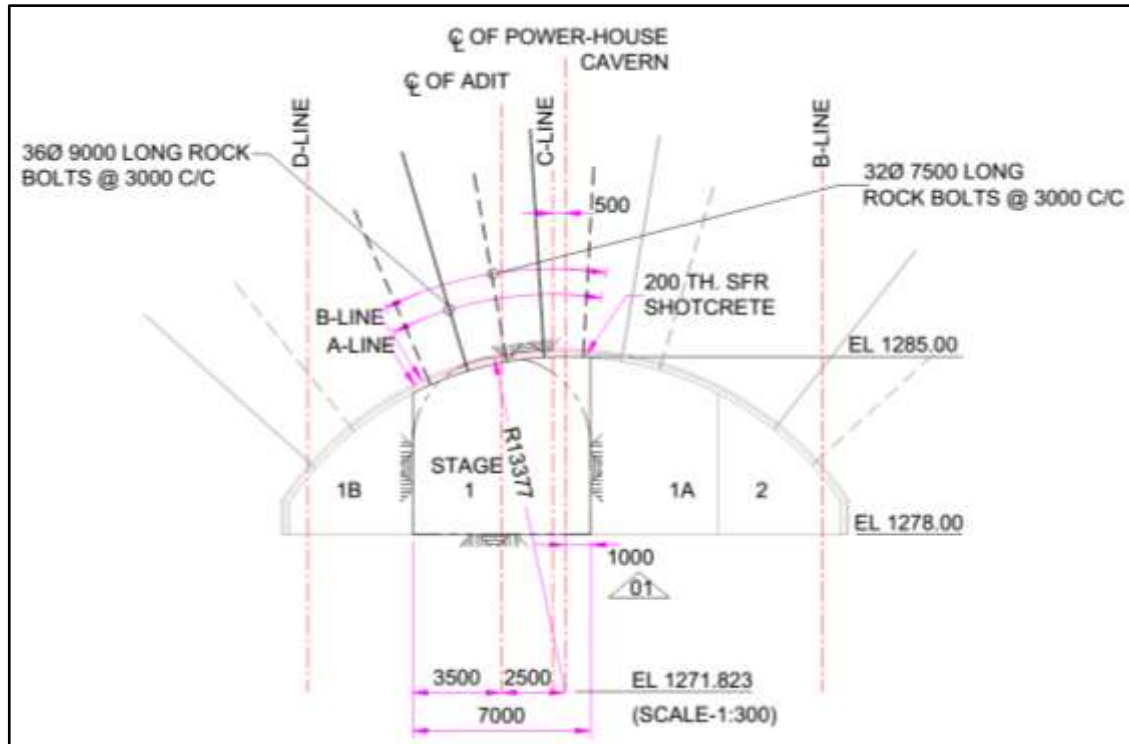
View of PH Cavern from Top Adit to PH Crown towards Main Access Tunnel
